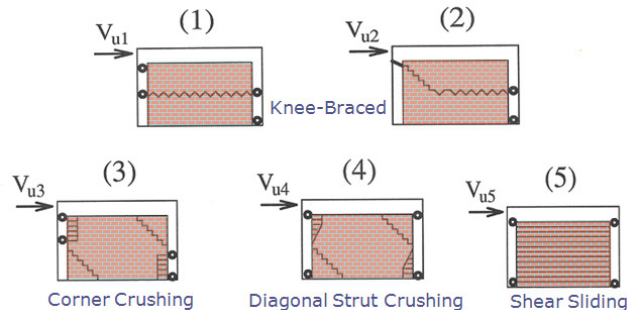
Common failure modes of unreinforced masonry infill walls in non-ductile reinforced concrete frames subjected to cyclic lateral load.
